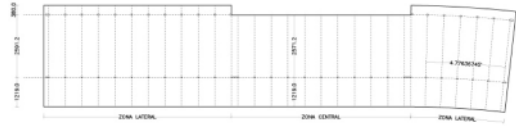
Scheme of Orense station roof plan showing the three different areas into which the roof was divided. (The author, from project documents).
